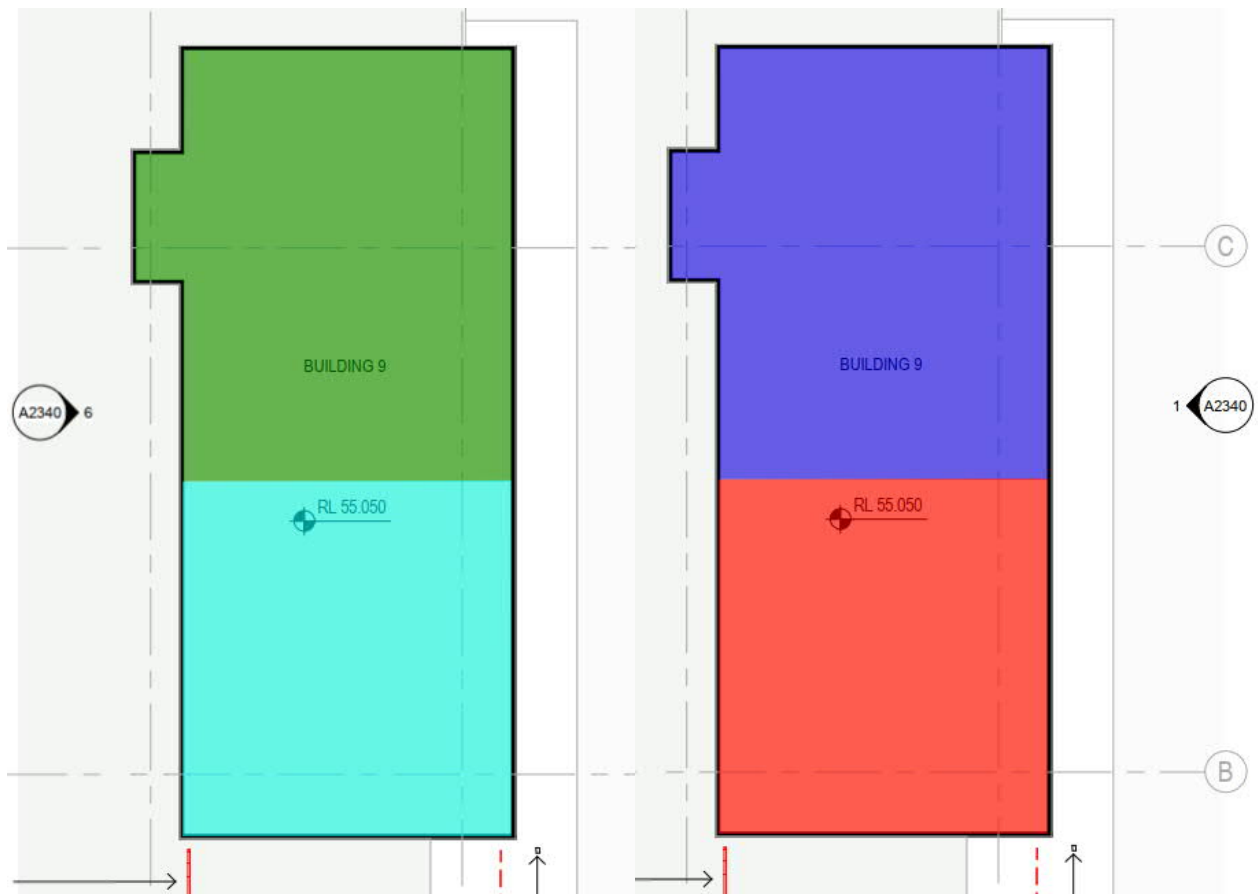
HVAC zones & thermal envelope for Building 9 Ground Floor (Left) and assumed First Floor (Right)
